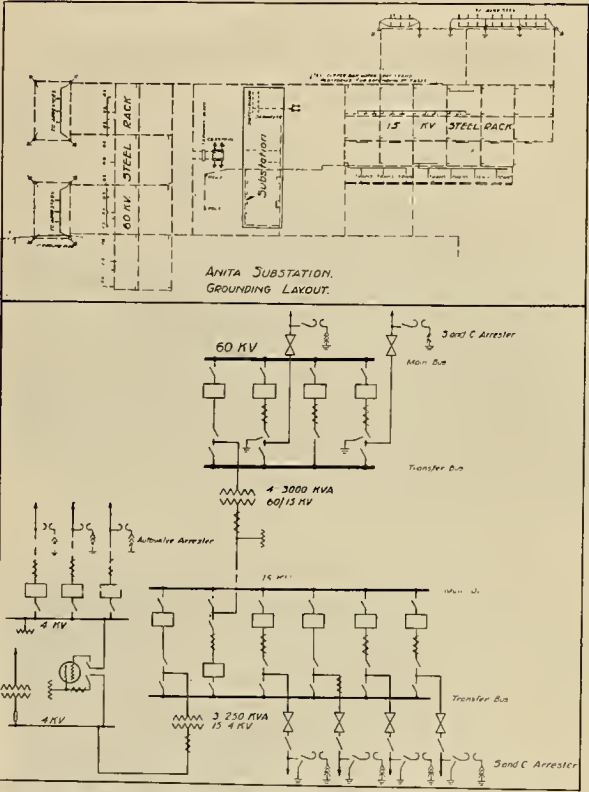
Below—single-line wiring diagram. Above—grounding layout; Anita substation.
